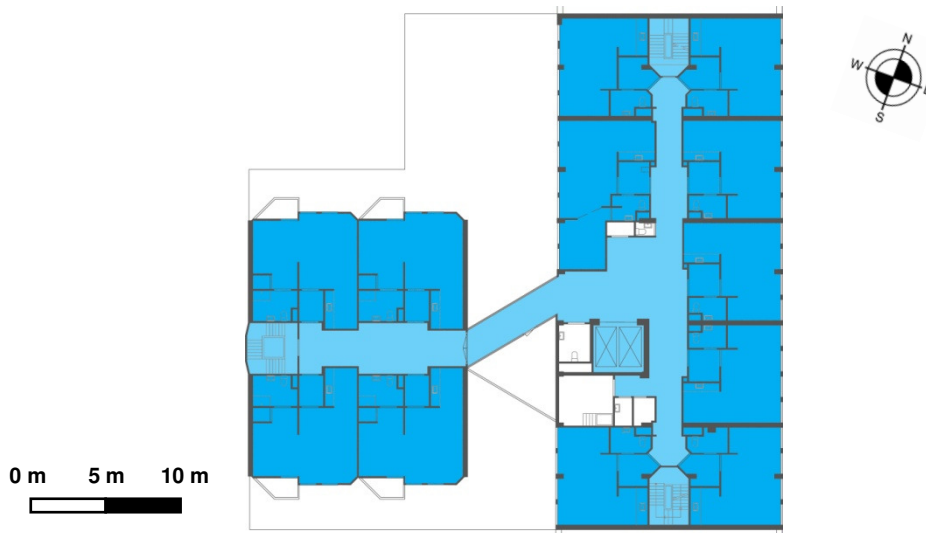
Floor plan of 1st - 5th floor with apartments (dark blue), hall (light blue) and other rooms (white)
